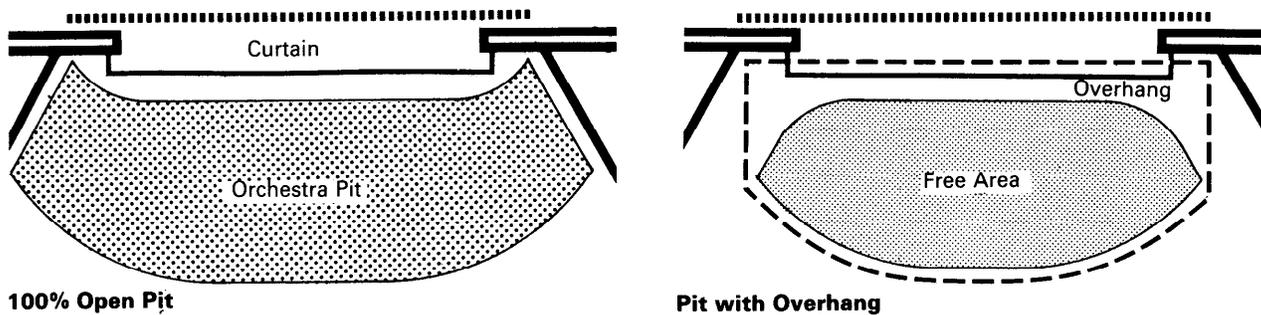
ORCHESTRA PIT PLAN
